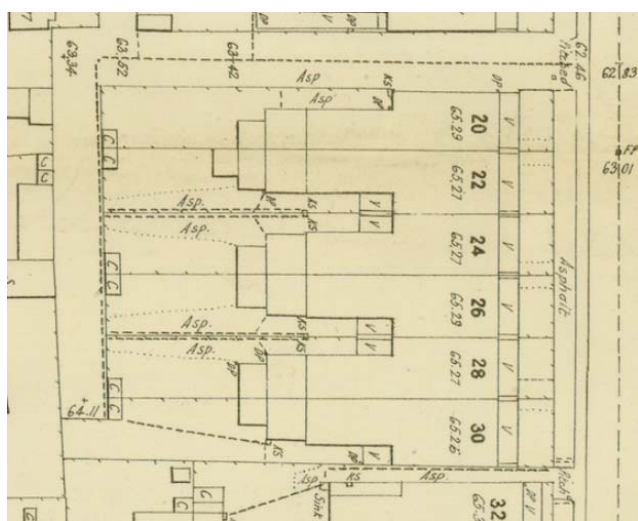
MMBW detail plan no. 965, dated 1896 (source: SLV).
